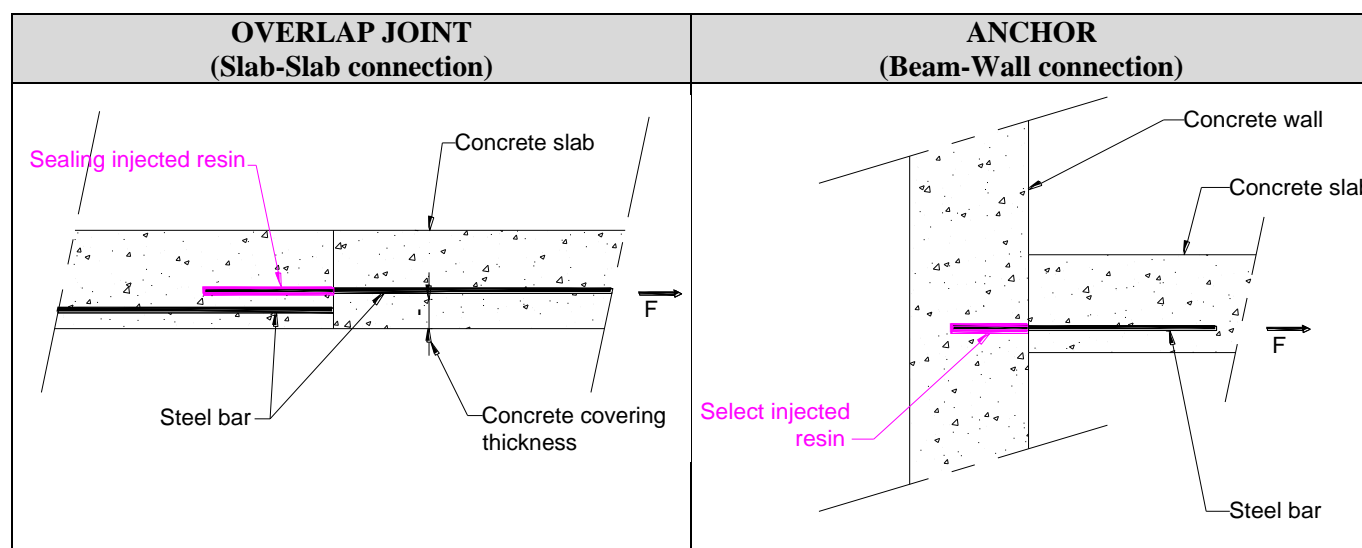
Sketches of a Slab-Slab connection left and of a Beam-Wall connection
